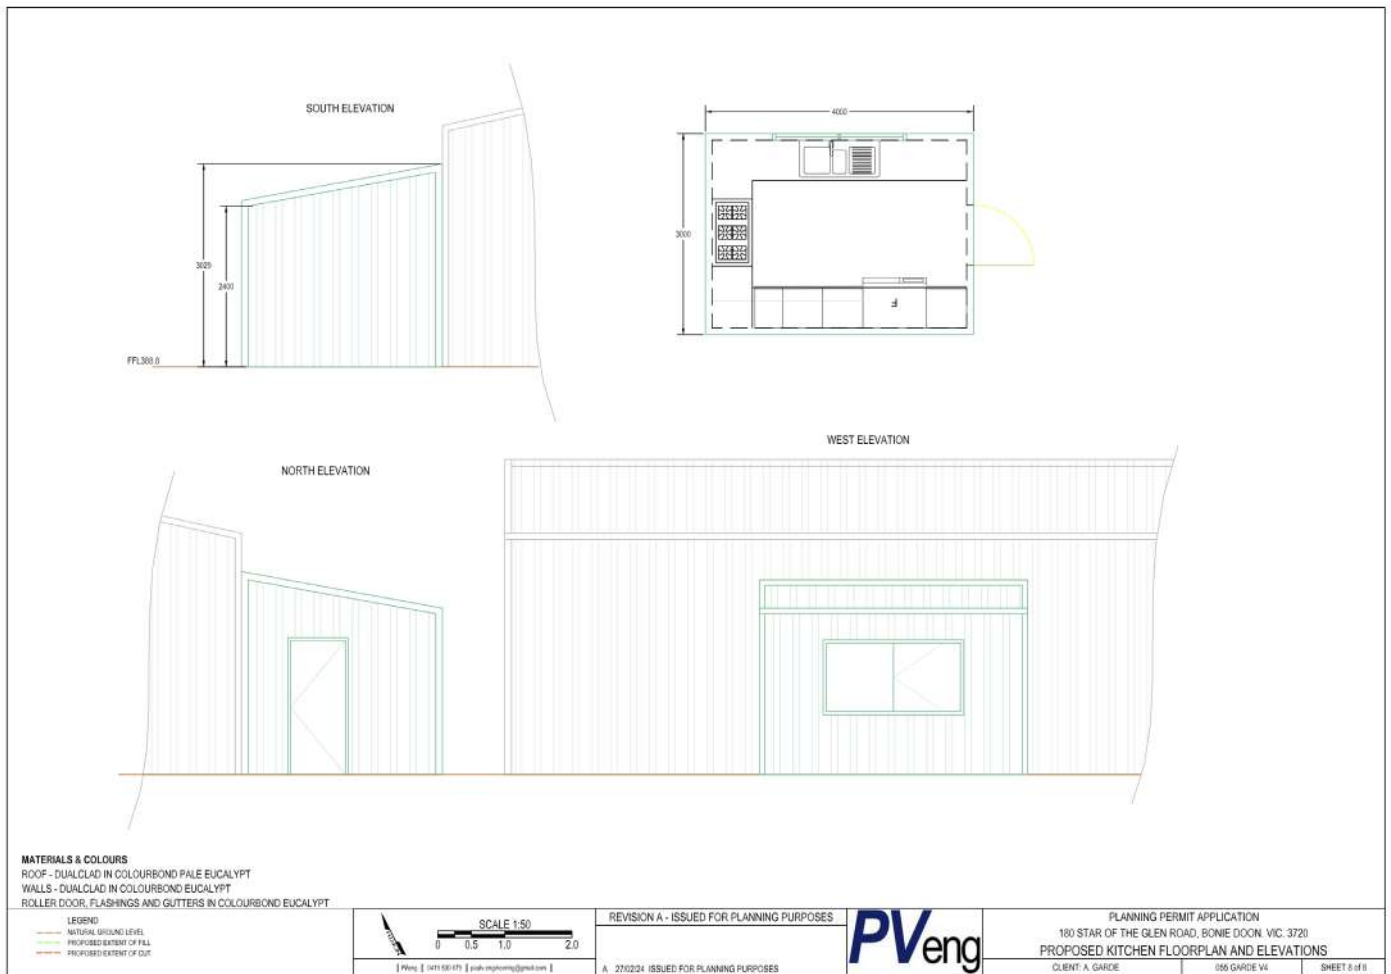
Concept plans for proposed Kitchen building attached to the proposed shed.
